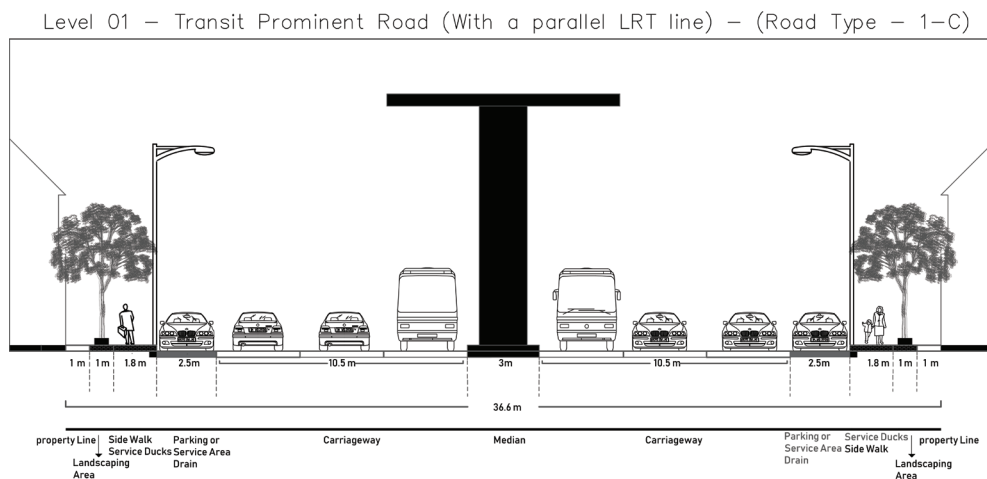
Cross section of a Level 01 – Transit Prominent Road (With a parallel LRT line) - (Road Type - 1–C)
